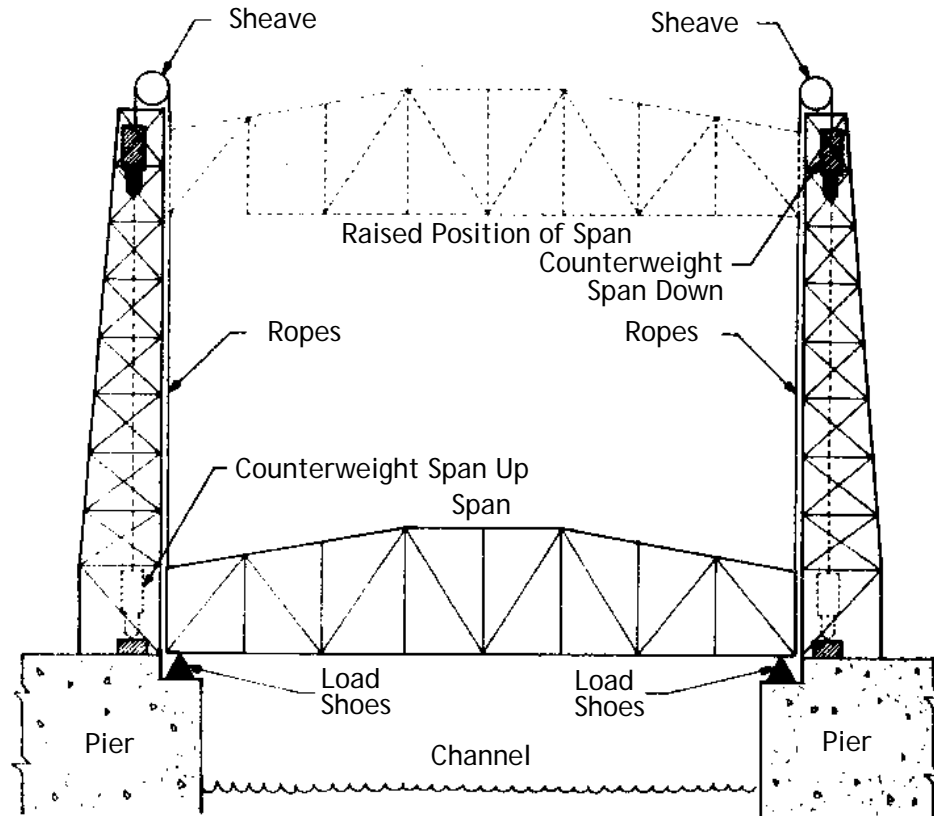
Closed Span Resting on Live Load Shoes
